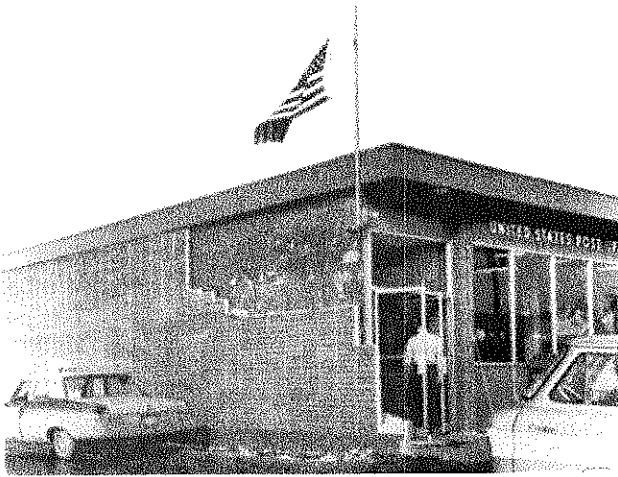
Damaged brick veneer can be a falling hazard. Post Restricted Use and barricade unsafe area.
